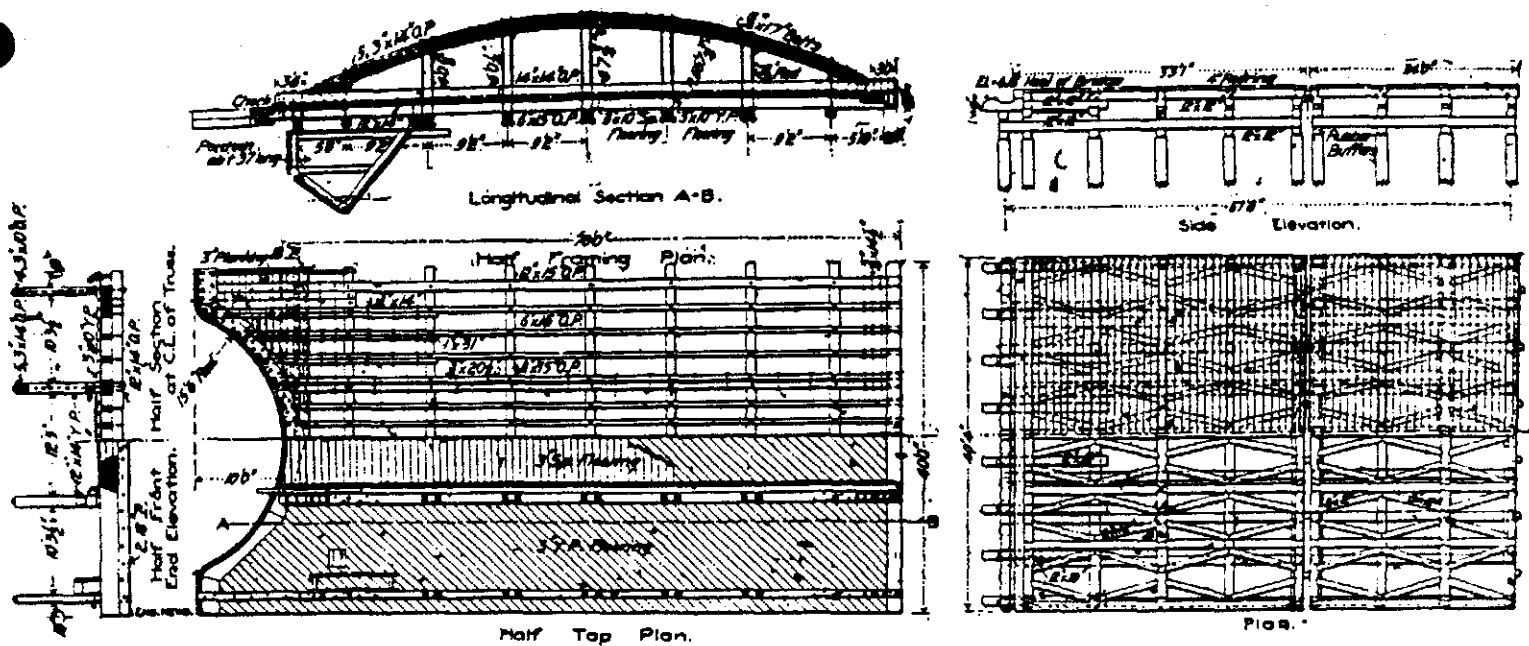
MAIN FERRY BRIDGE AND BUFFER PLATFORMS.
